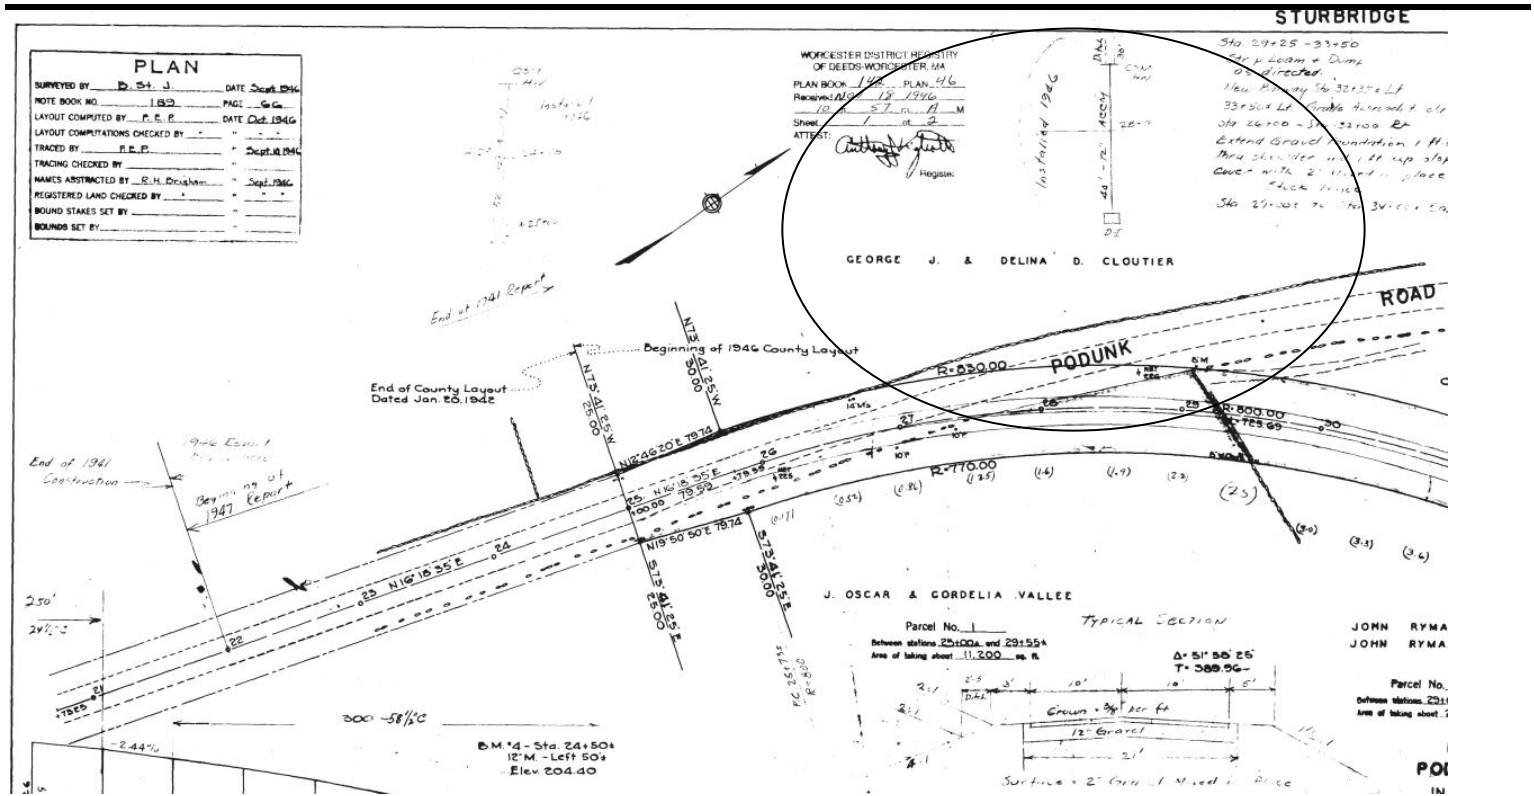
1946 Land Plan showing the Cloutier Property along Podunk Road.
